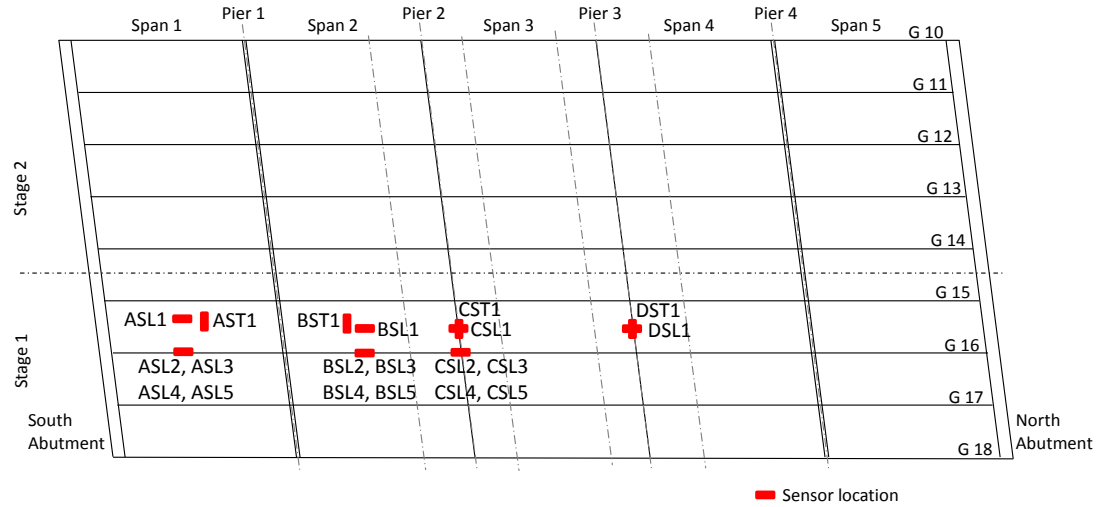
Plan view of VWSG sensor location of Patcong Creek Bridge
